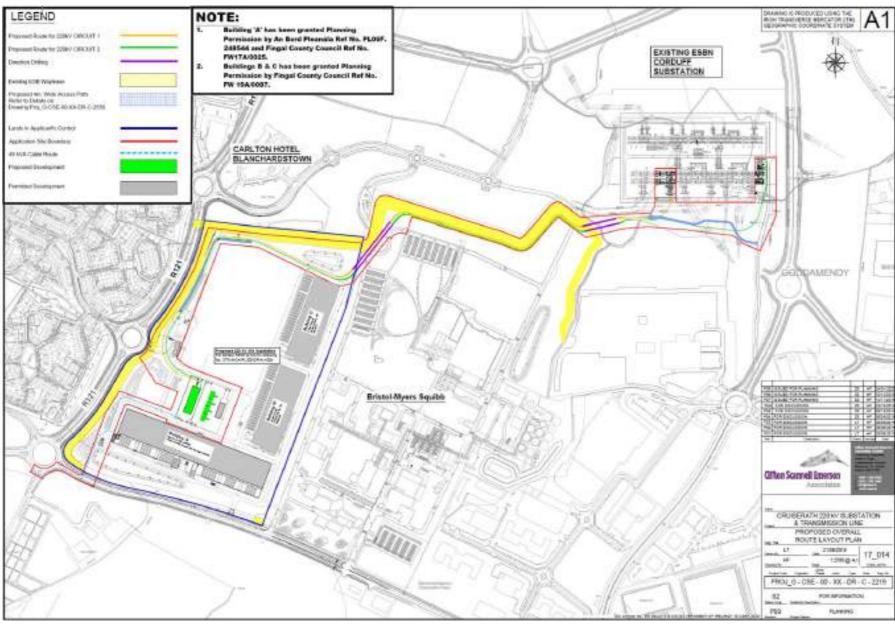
Proposed site layout plan illustrating red line boundary (Source: Clifton Scannell Emerson Associates, January 2020)
